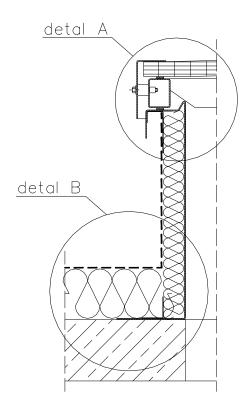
Installation of the roof access hatch with standard base on the roof structure (ITEM B) with PVC membrane or roofing paper (ITEM A).
